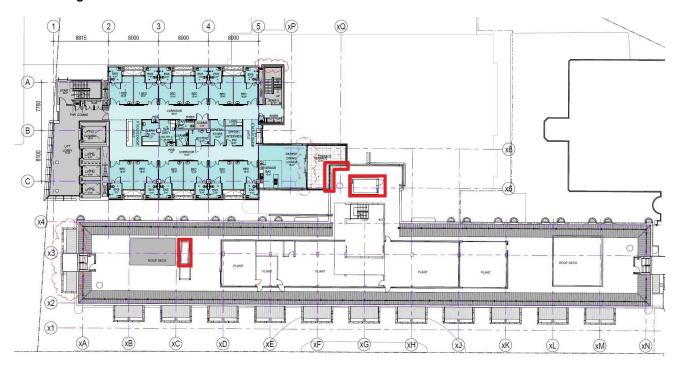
Level 11 plan, as approved under SSD6840 MOD 1. The approximate areas of demolition works proposed in this modification are noted by the red squares.
